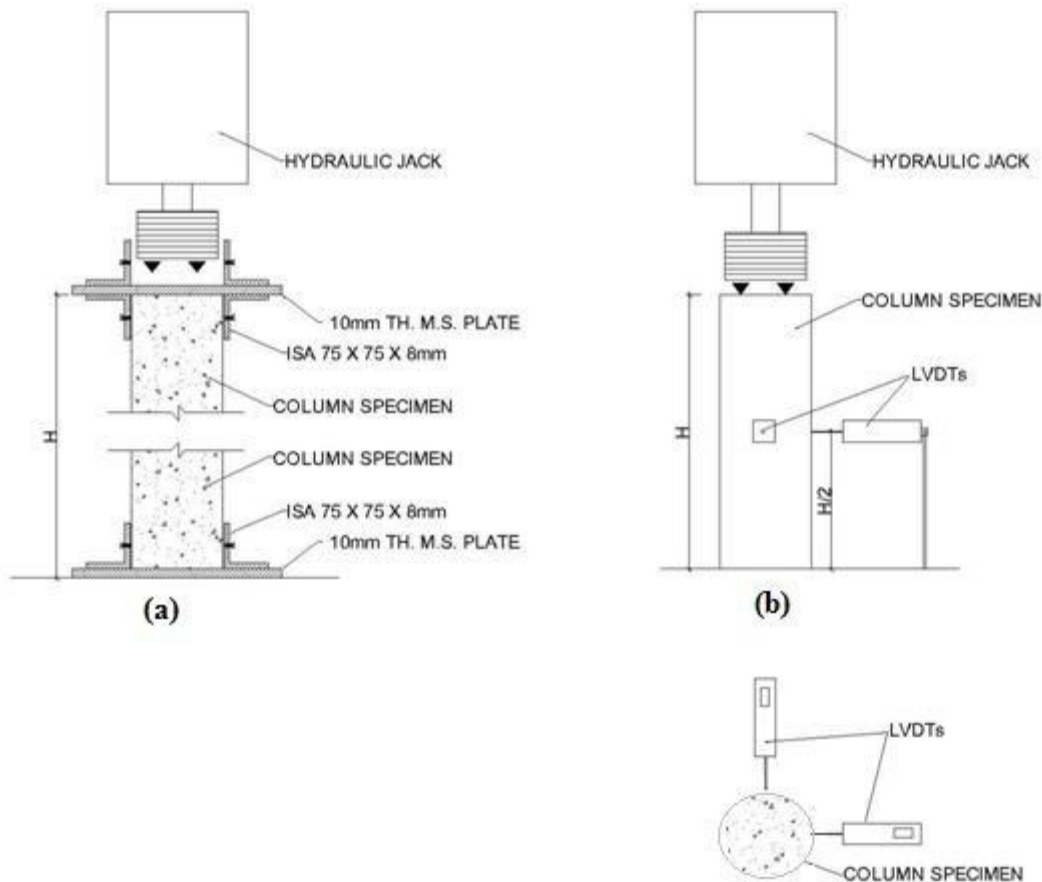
Detail of Test Setup (a) Test setup for type LC (b) Mode of Loading and Position of LVDTs and Plan of Position of LVDTs
